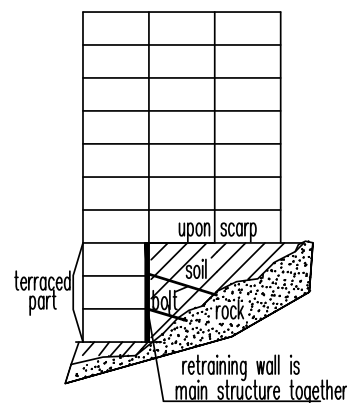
Terraced structure diagram(Retaining wall is connected with the main structure)
